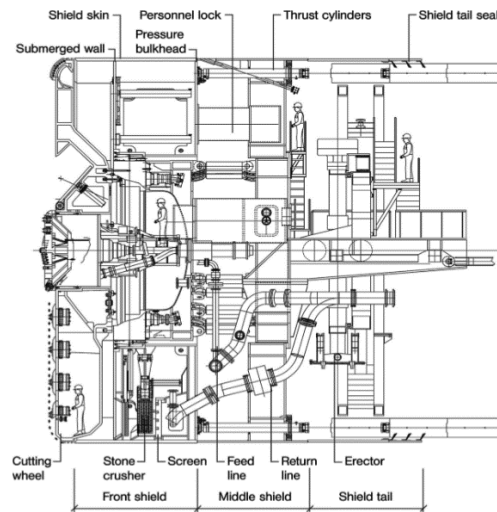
Constructional elements of mixed shield _ longitudinal section [5] (Herrenknecht)
